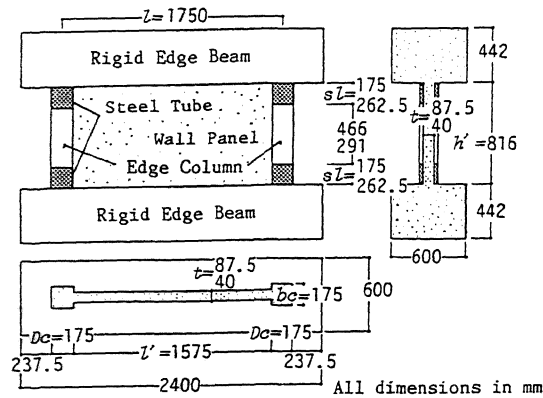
Nominal dimensions of 1/3 scale model test specimen
